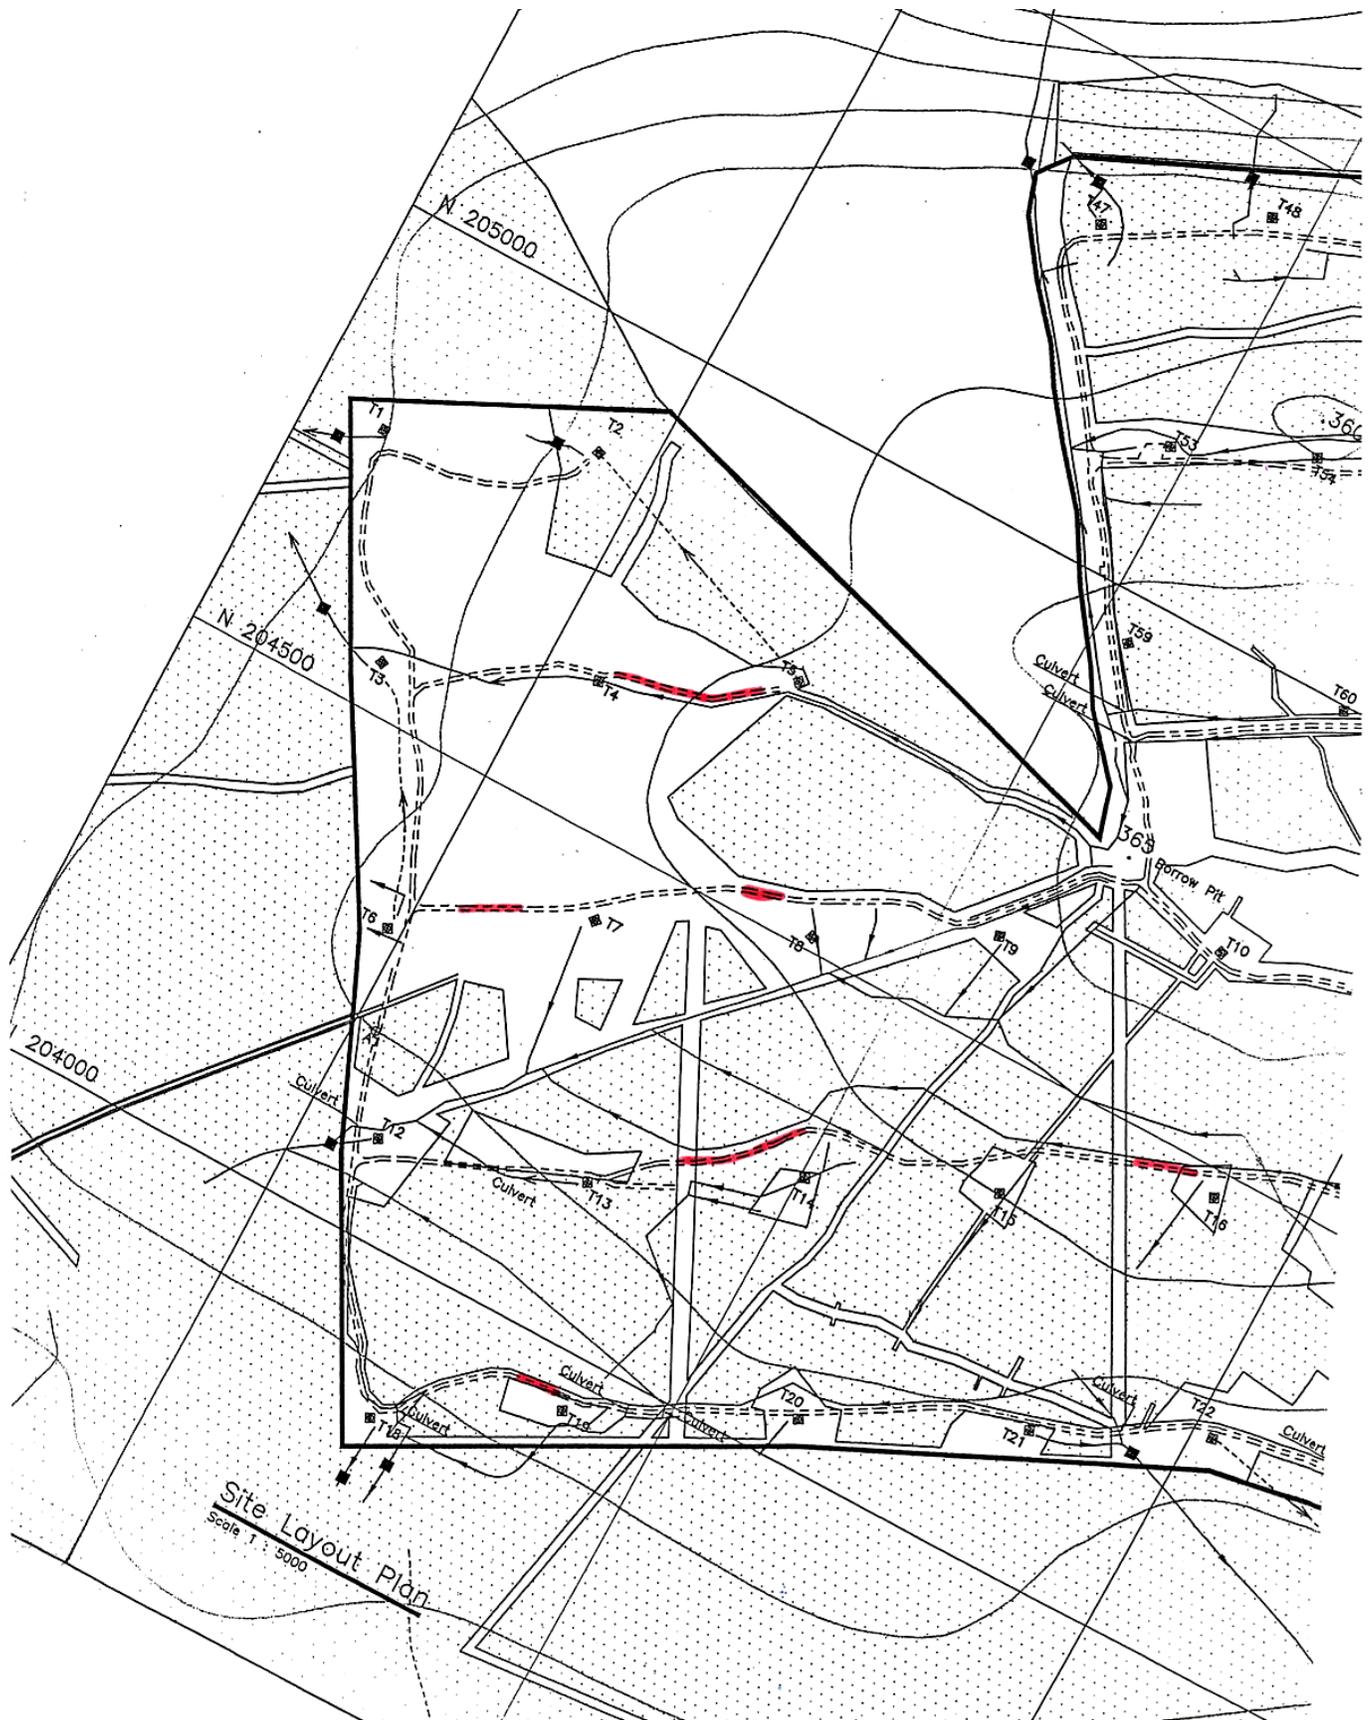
Sections of floating road classified as poor on west side of site (marked in red)
